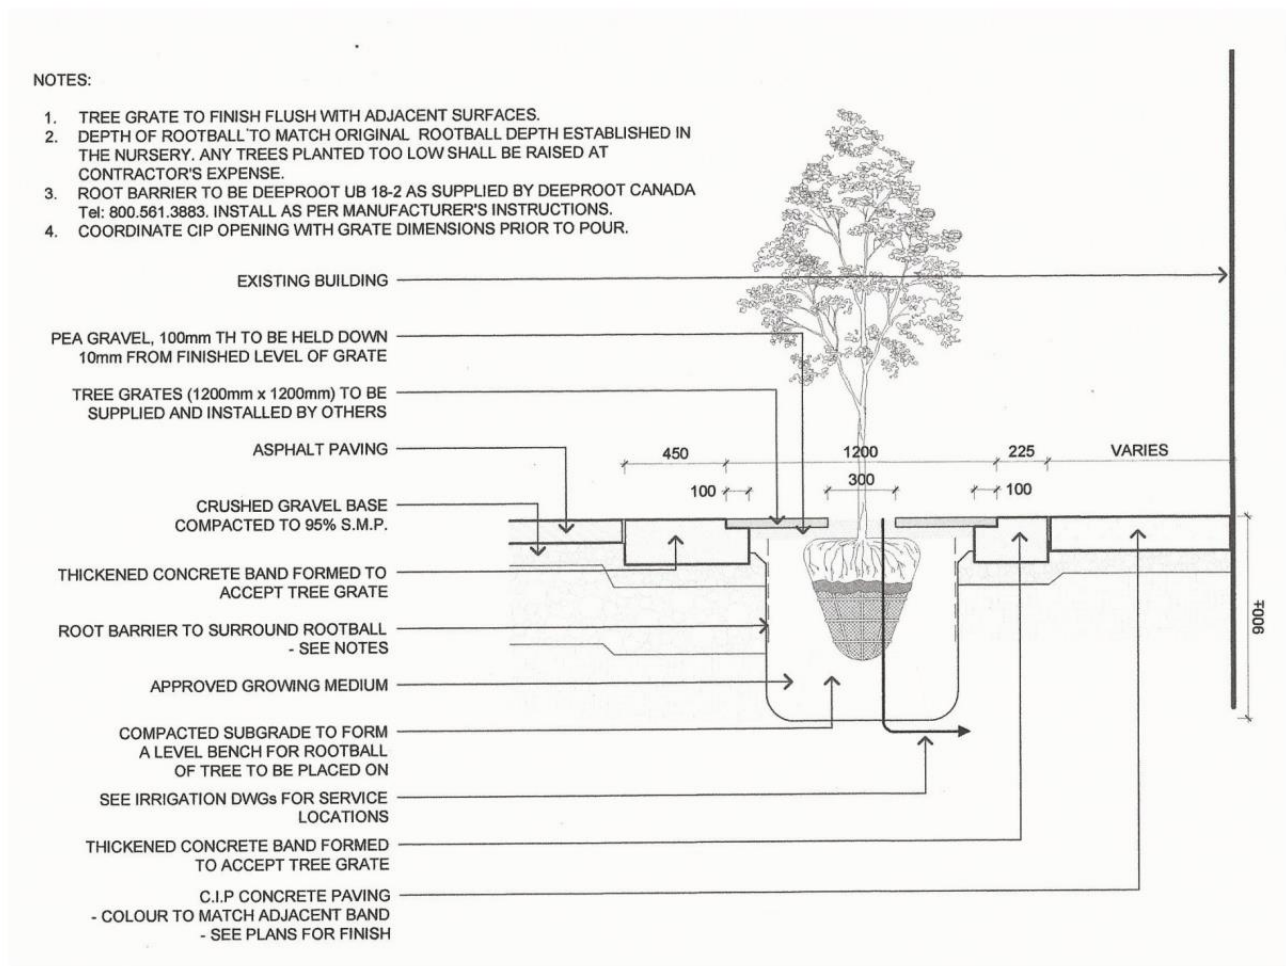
Hall Street design plan for tree grate finish design with DeepRoot barrier system to be augmented by a Silva Cell-Type System (MMM Group, 2015)
